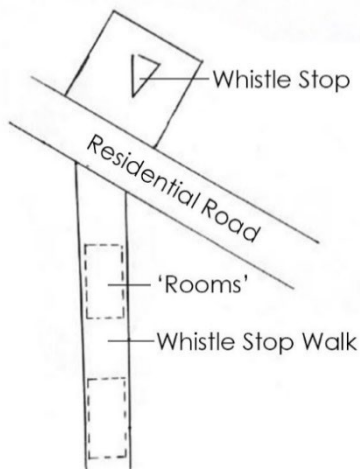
Hand sketch of proposed Whistle Stop Walk design
